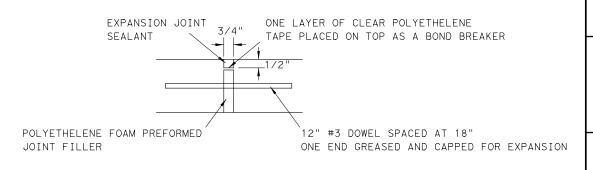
DETAIL FOR PLACEMENT OF DOWELLED CONCRETE CURB CAN ALSO BE USED FOR GRASS ISLAND AND MEDIAN LOCATIONS
